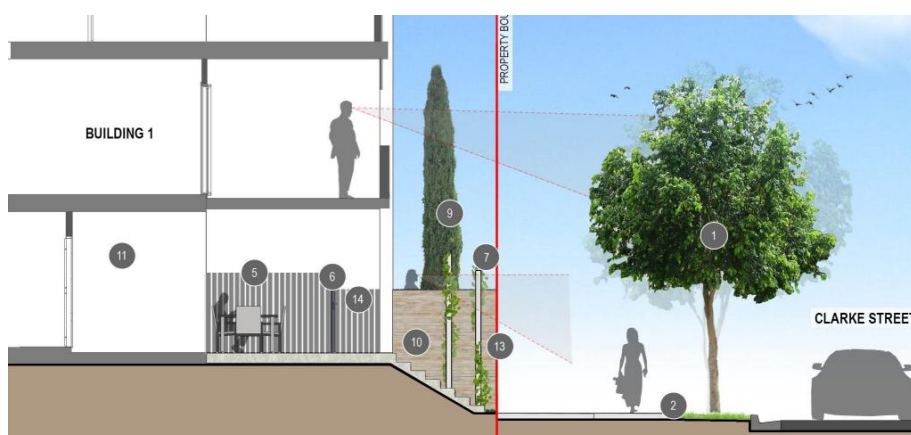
Clarke Street section – Building 1 with pedestrian entries
